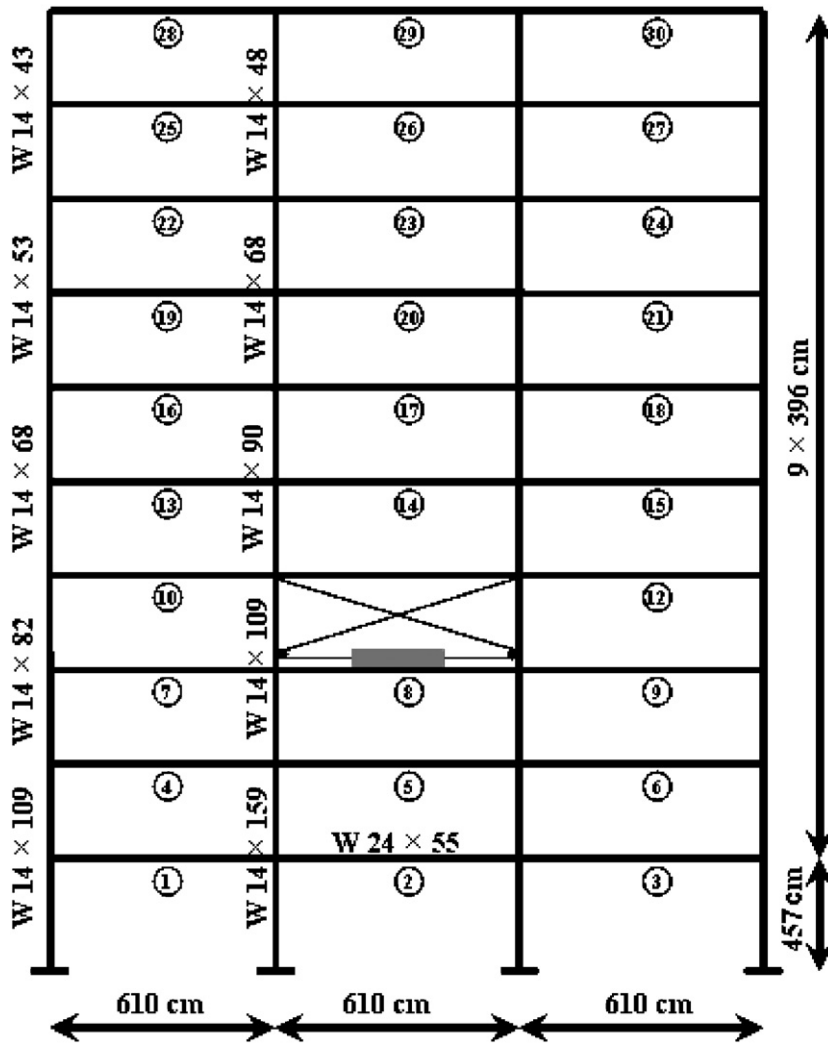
Ten-storey framed structure and a typical tendon arrangement at location 11.
